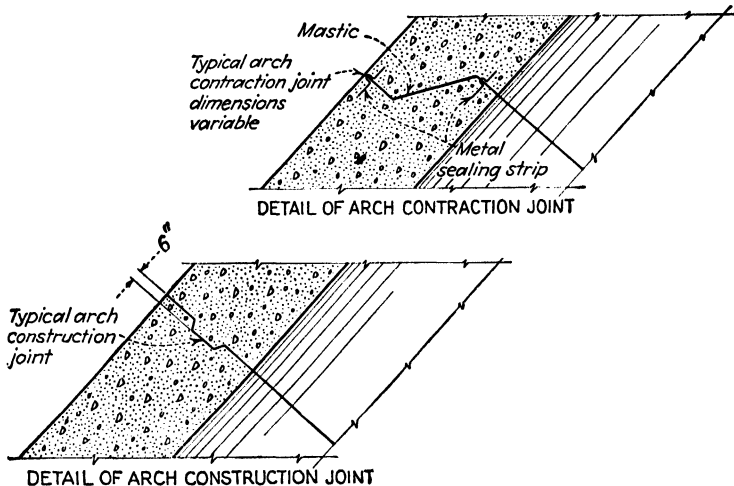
Bartlett Dam. Detail of arch construction and contraction joints.
